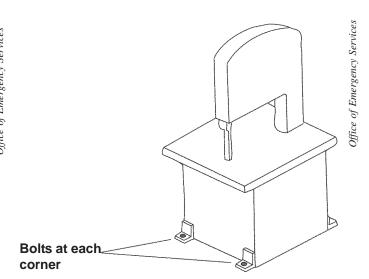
Bolting equipment. Light equipment can be bolted to a concrete floor with expansion bolts. For methods of securing heavier equipment, consult an engineer.
